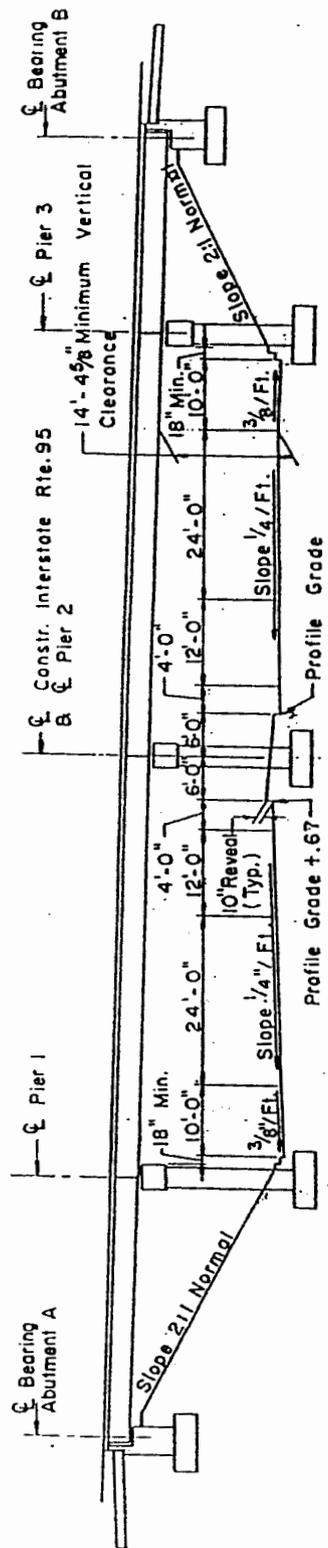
Garden Street Bridge #547: Bridge Plan
